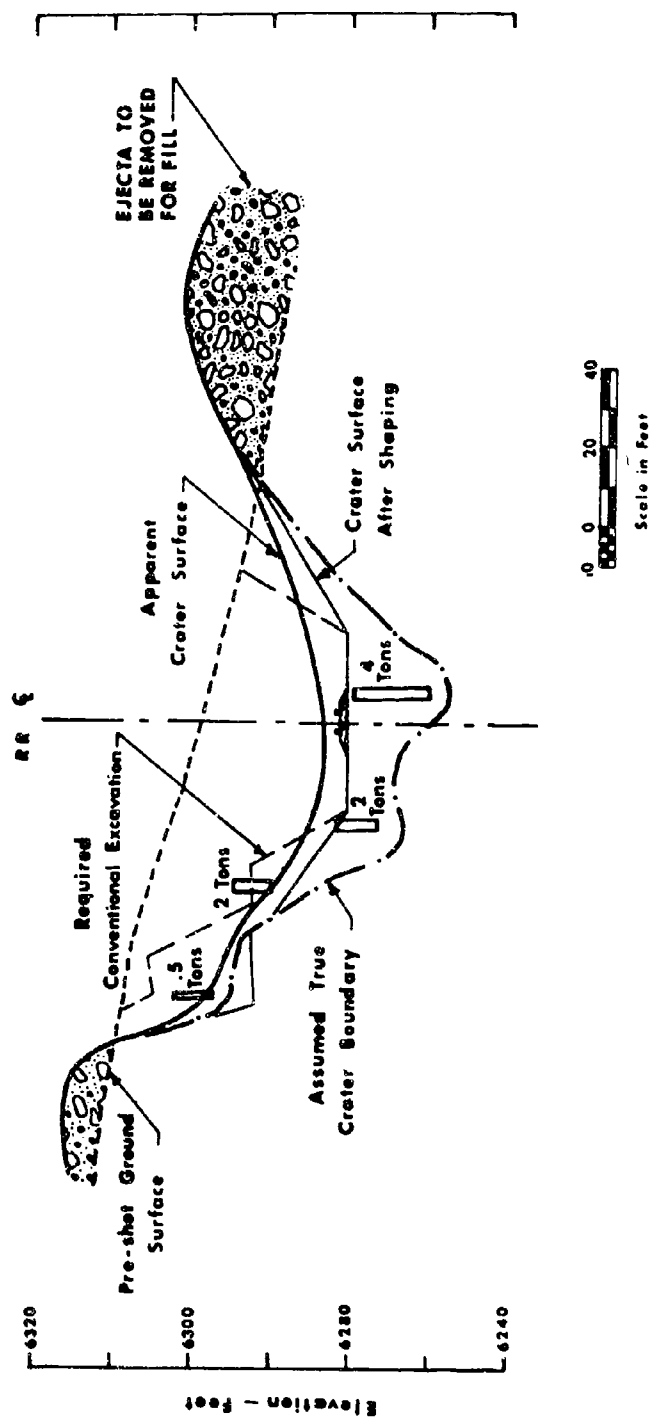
Design for Typical Cross Section of Trinidad Railroad Cut (Cratering)
